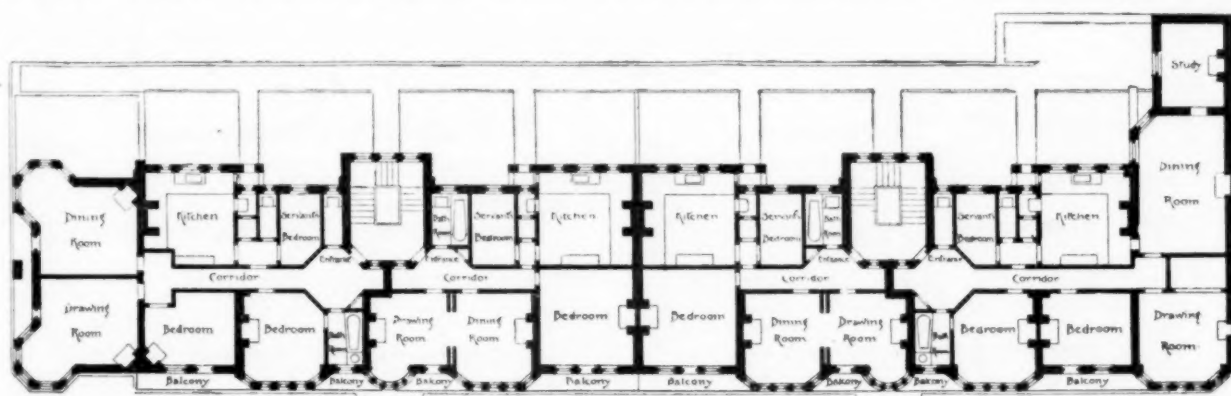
Plan of Upper Stories of an Apartment-house in London. After the *Builder*.
